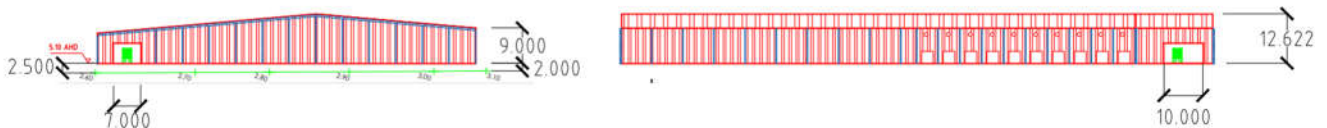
West (left) and South (right) Elevations of Proposed Warehouse (Source: Manildra Group)
